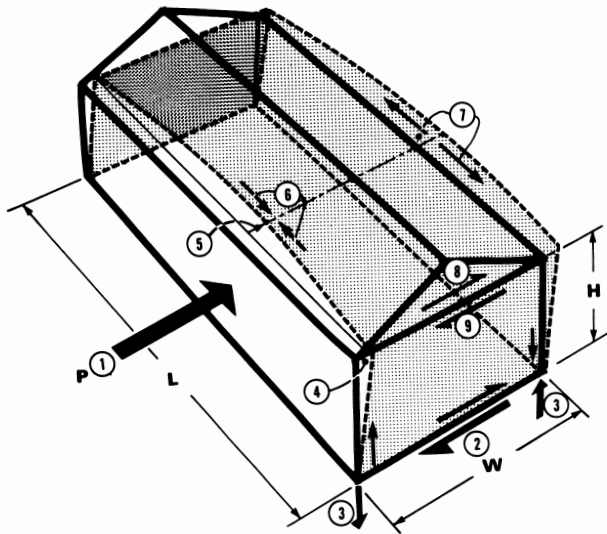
Diaphragm principle for resisting wind perpendicular to the long wall of a typical farm building. (1) Critical wind, direction perpendicular to long wall; (2) foundation horizontal reaction to wind force; (3) foundation reaction to overturning at endwall; (4) shear deformation in end wall diaphragm; (5) shear and bending deformation in ceiling diaphragm; (6) plate beam compression due to ceiling bending; (7) ceiling beam tension due to ceiling bending; (8) maximum ceiling shear stress; (9) endwall shear stress.
